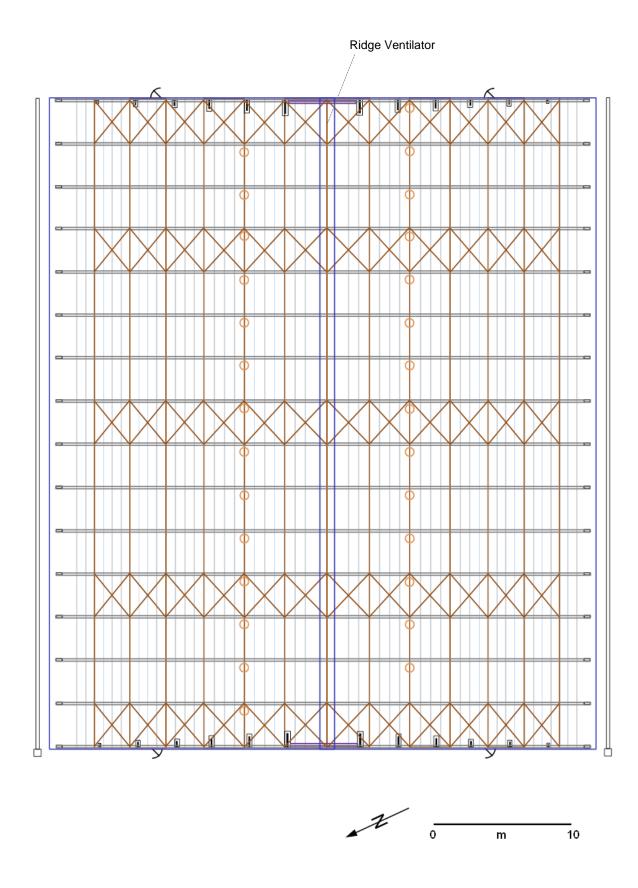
Plan of CUST Hut, showing trusses and roof elements
